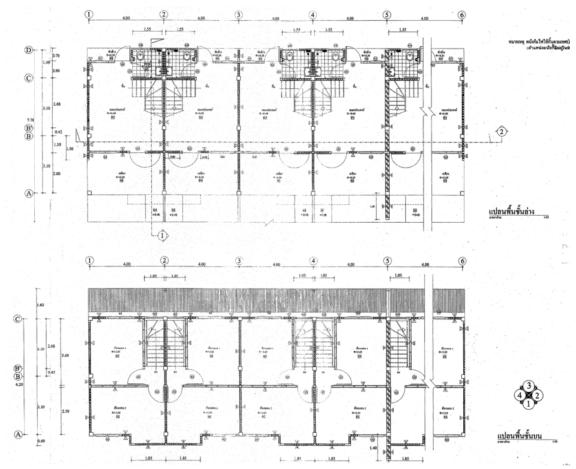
Floor plans of the NHA row house for low and medium income earners.
